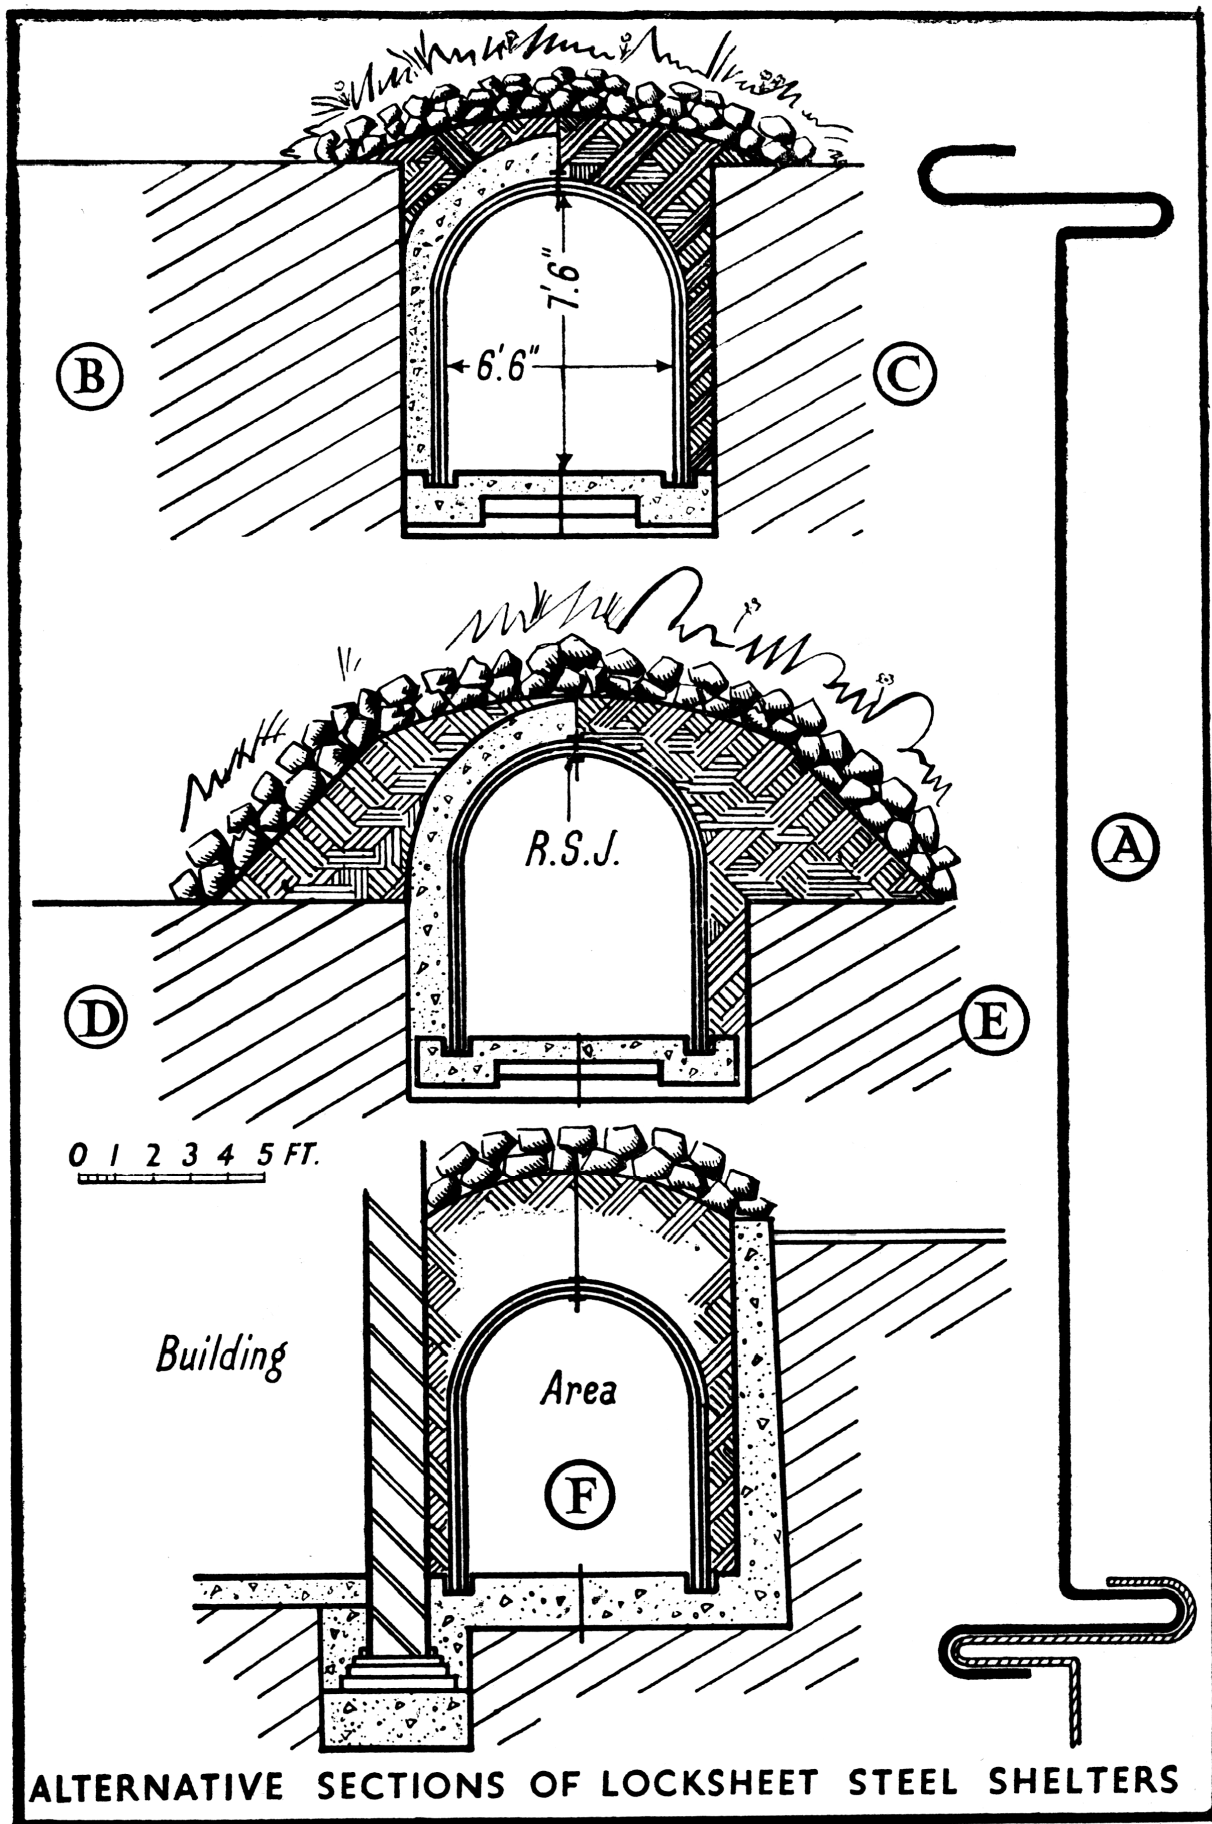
Costain's locksheet steel shelters. A, enlarged section of locksheet steel; B, constructed in deep trench and covered with concrete, earth and rubble; C, constructed in deep trench and covered with earth and rubble; D and E, partly underground, and F, in area of building.
